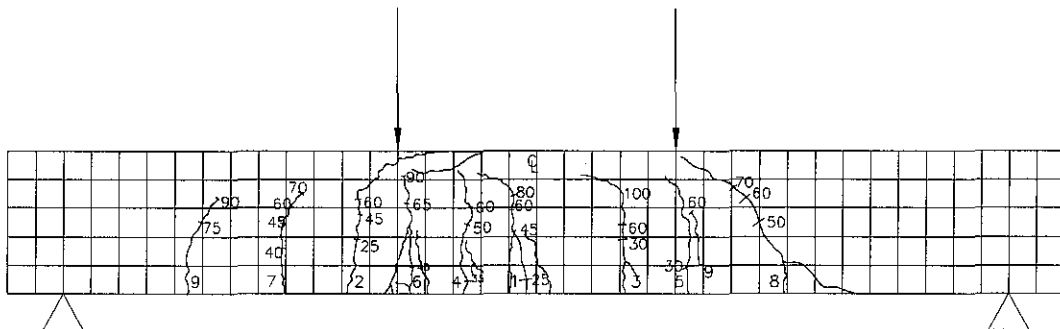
20. Crack pattern of MSCC beam specimen (shear failure)
